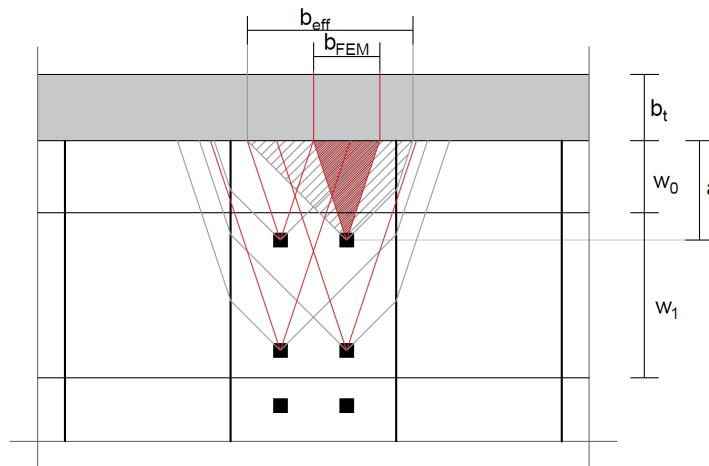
Bilateral isotropic and orthotropic behaviour of the floor plate in distributing loads towards the side girder
